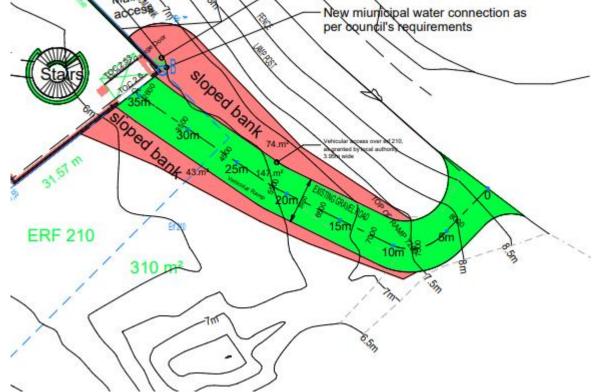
Driveway layout across Erf 210 to Erf 222, indicating excavated slopes.
